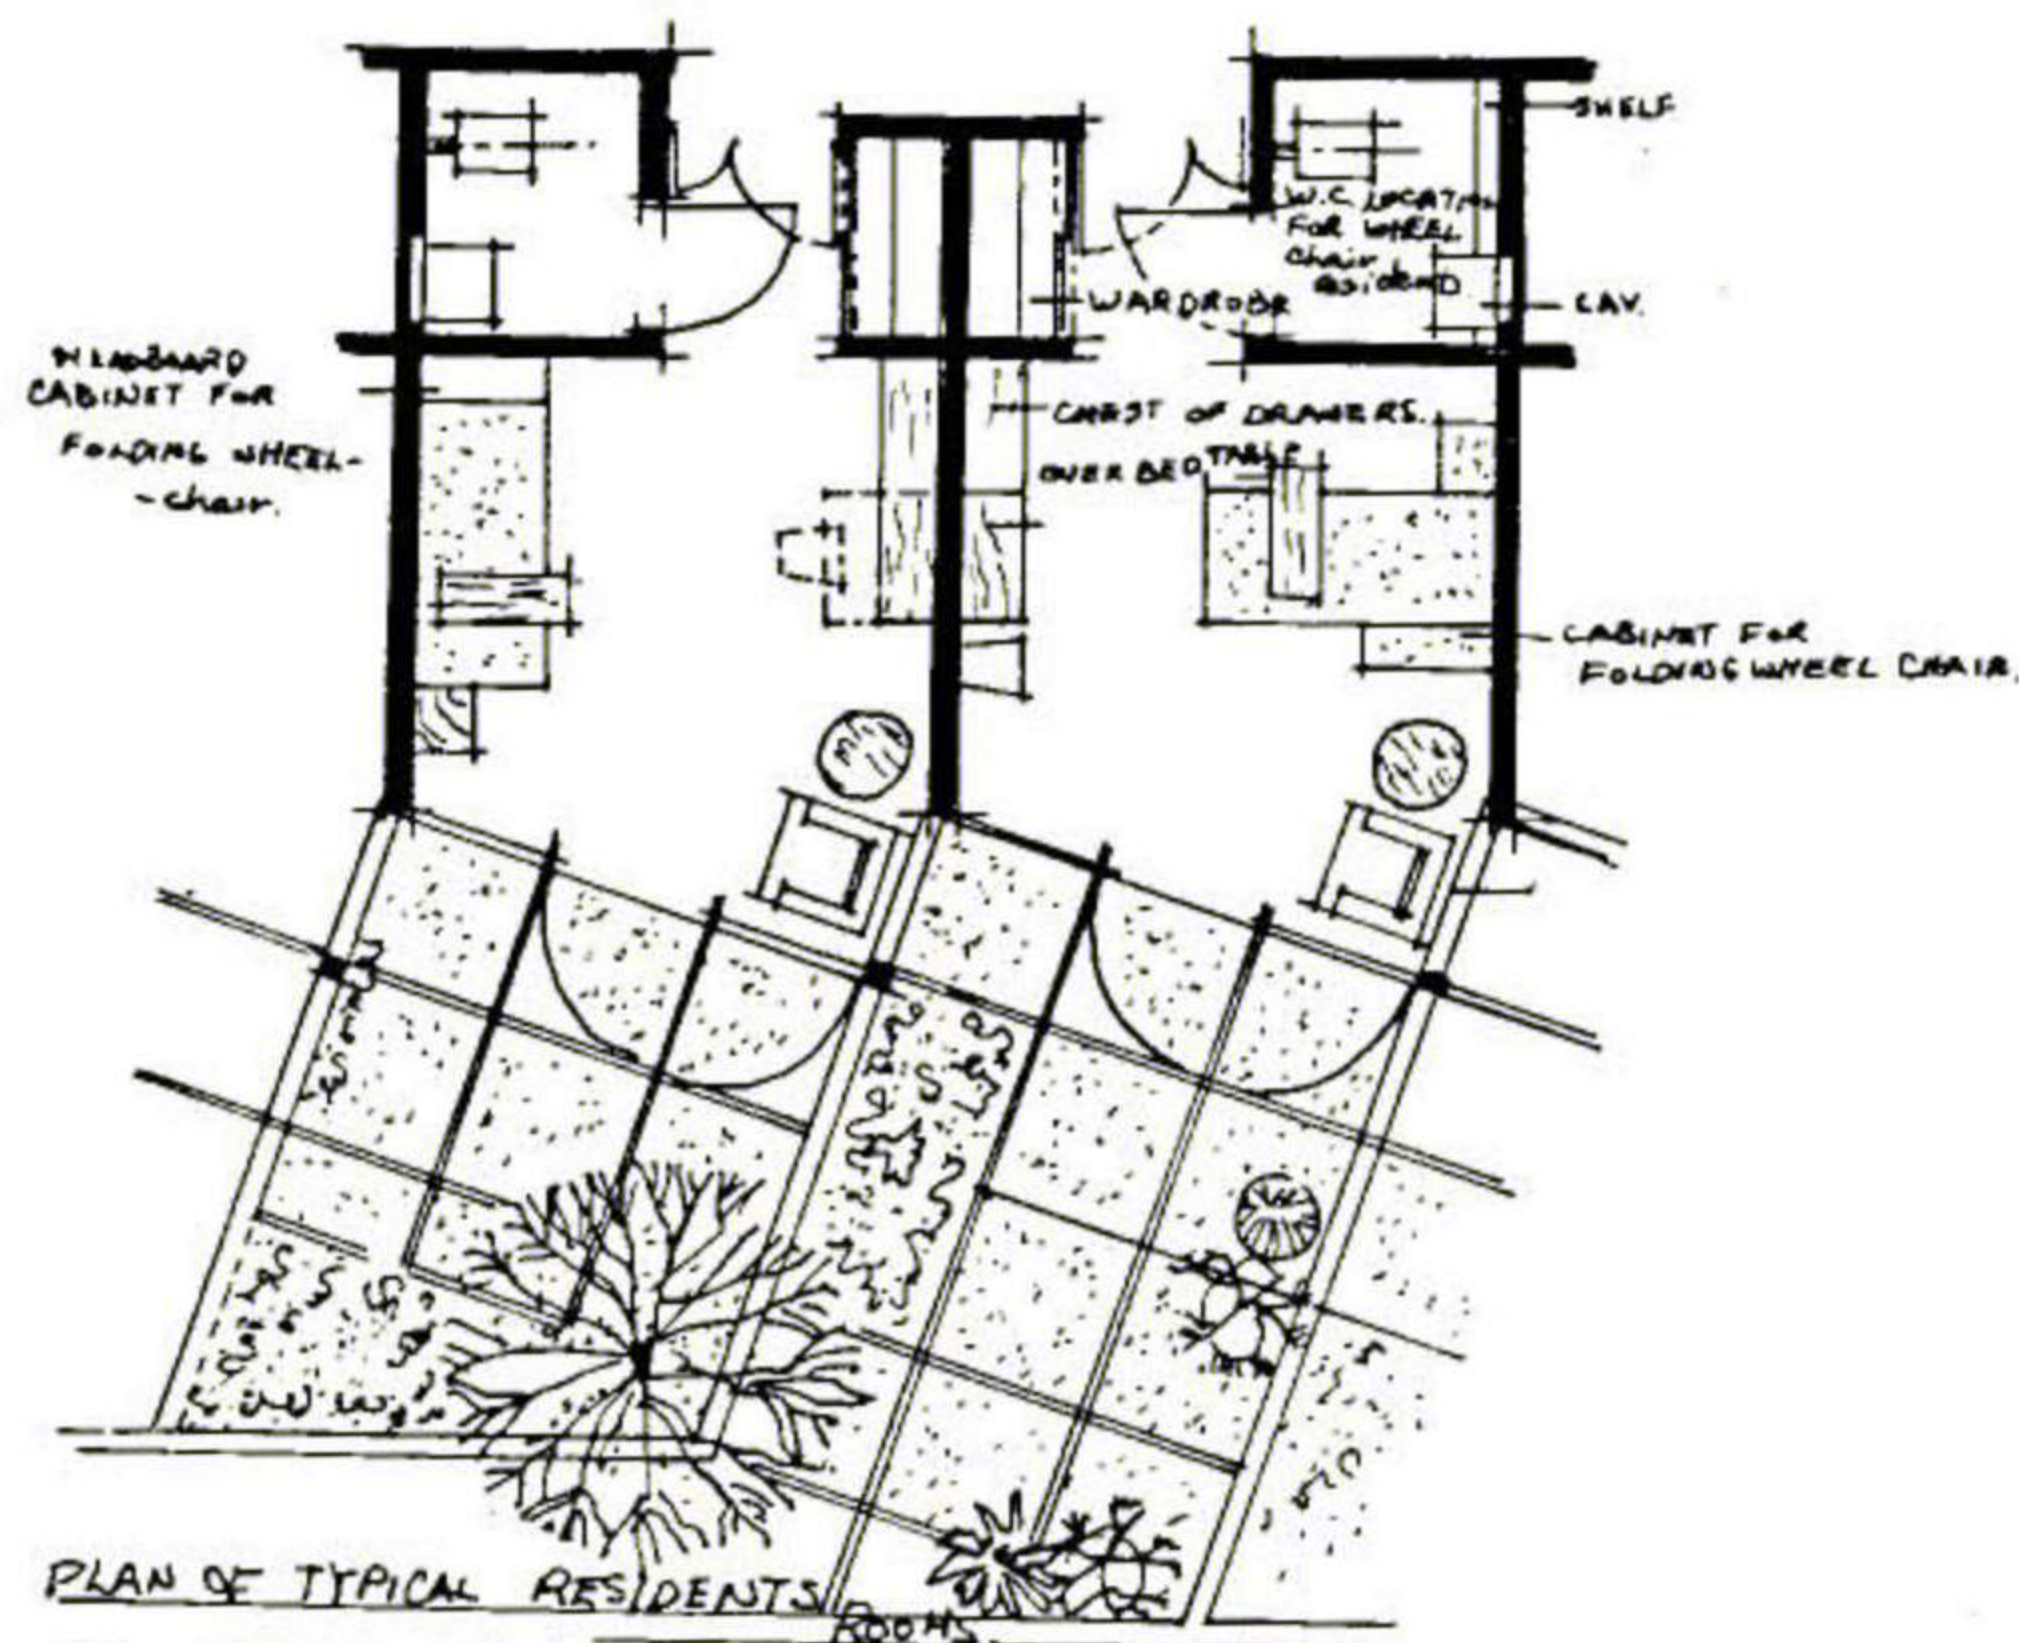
Plan of typical Residential Room. Arch Gold & Leaf
